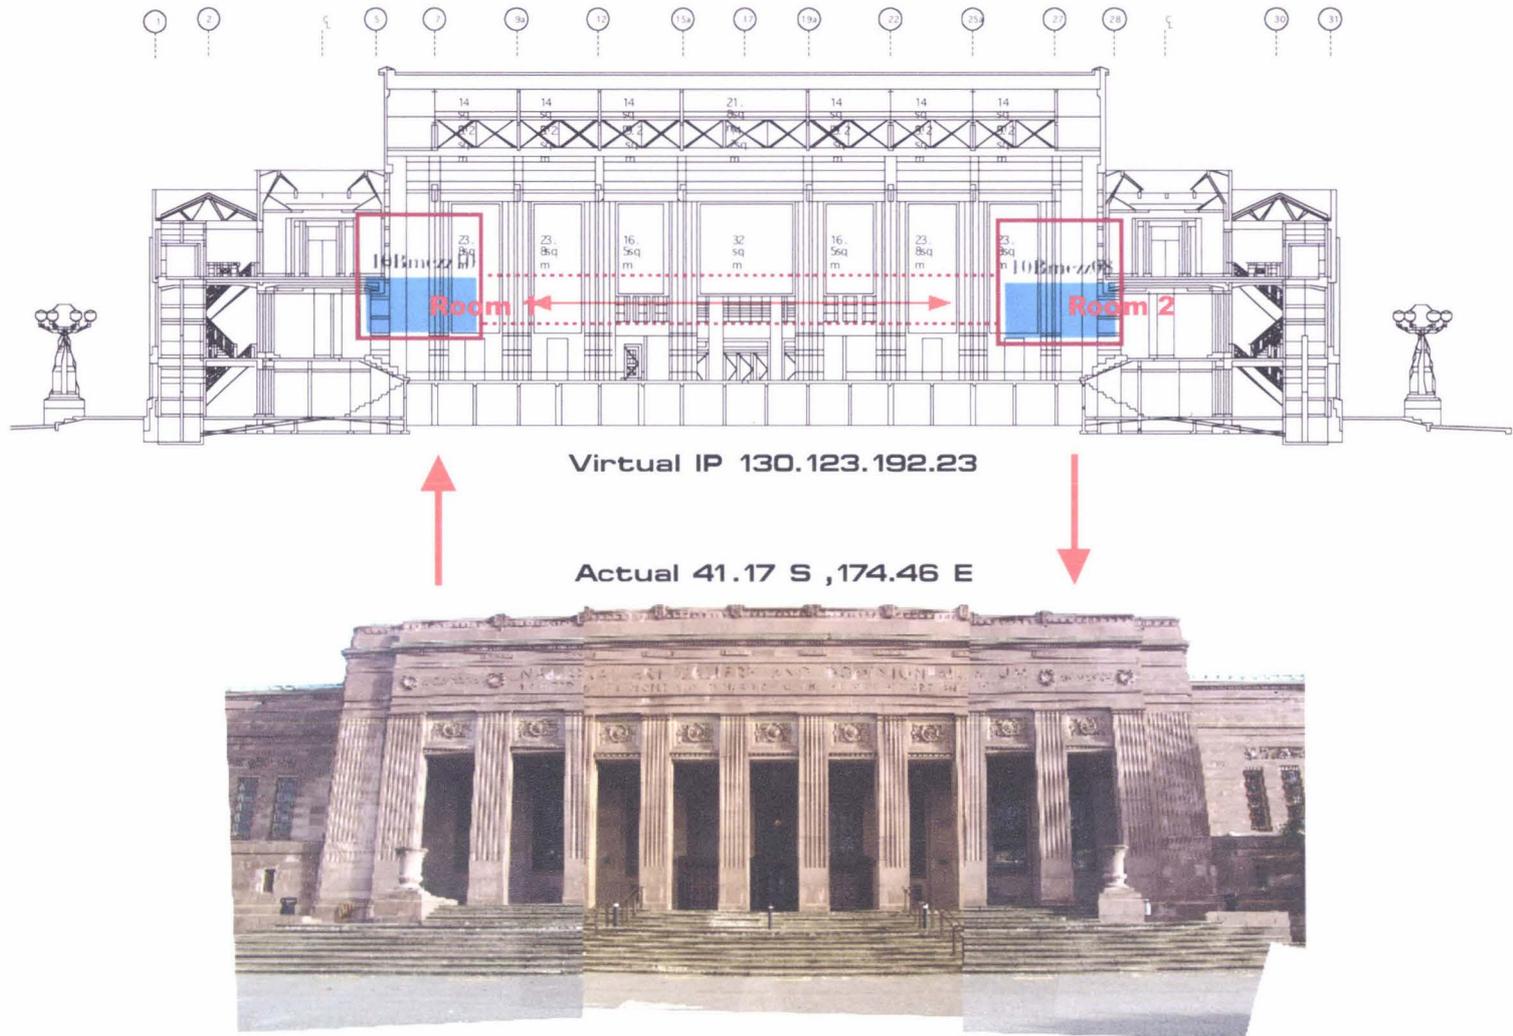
Elevation of site structures, Digital/Physical, Dominion Museum, Wellington New Zealand 'Being @', (Author, 2006).
